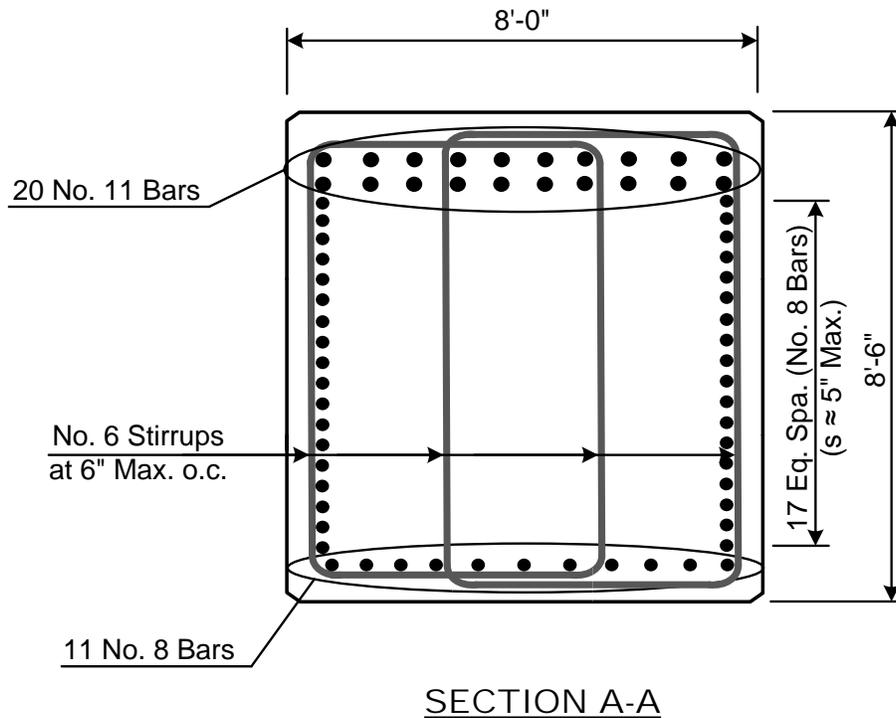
Elevation View of Reinforcement Details (Based on STM Specifications)
